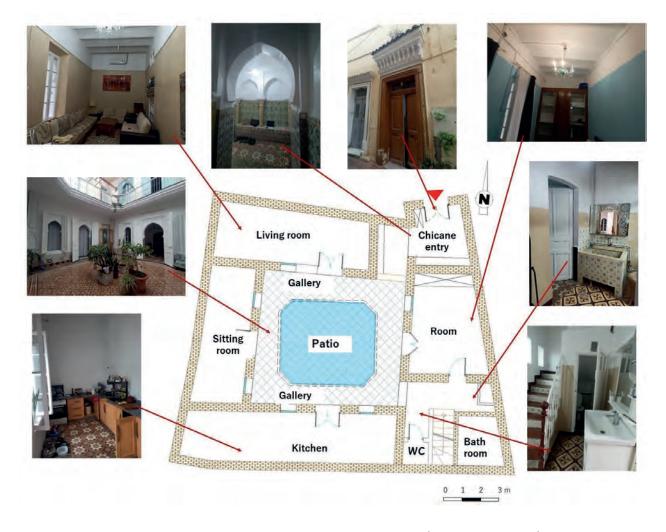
Plan of the lower level of house N° 03 - Dar Nebia in Bab El Hadid. (source: the authors).
